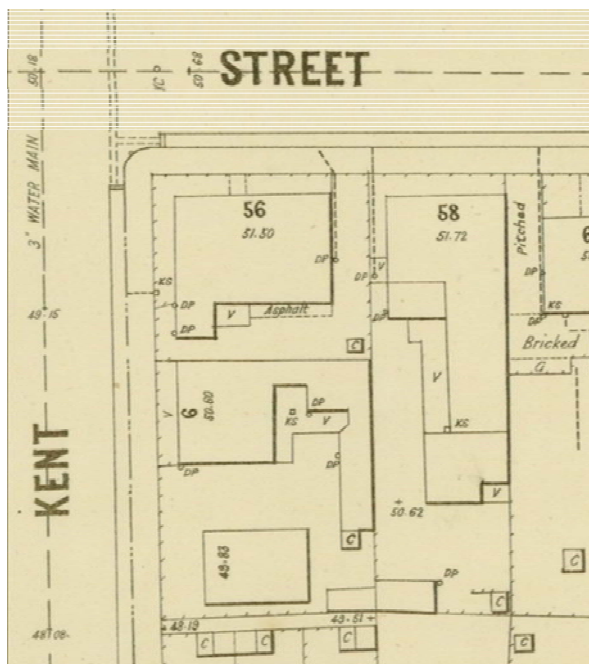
MMBW detail plan no. 963, dated 1898. Note the long rear wing of no. 58, in two parts, which may have encompassed the earlier timber house (since demolished). (source: SLV).
